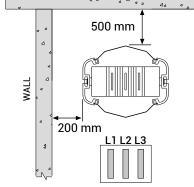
SAMPLE WALL CROSSING WITH FIRE BARRIER
